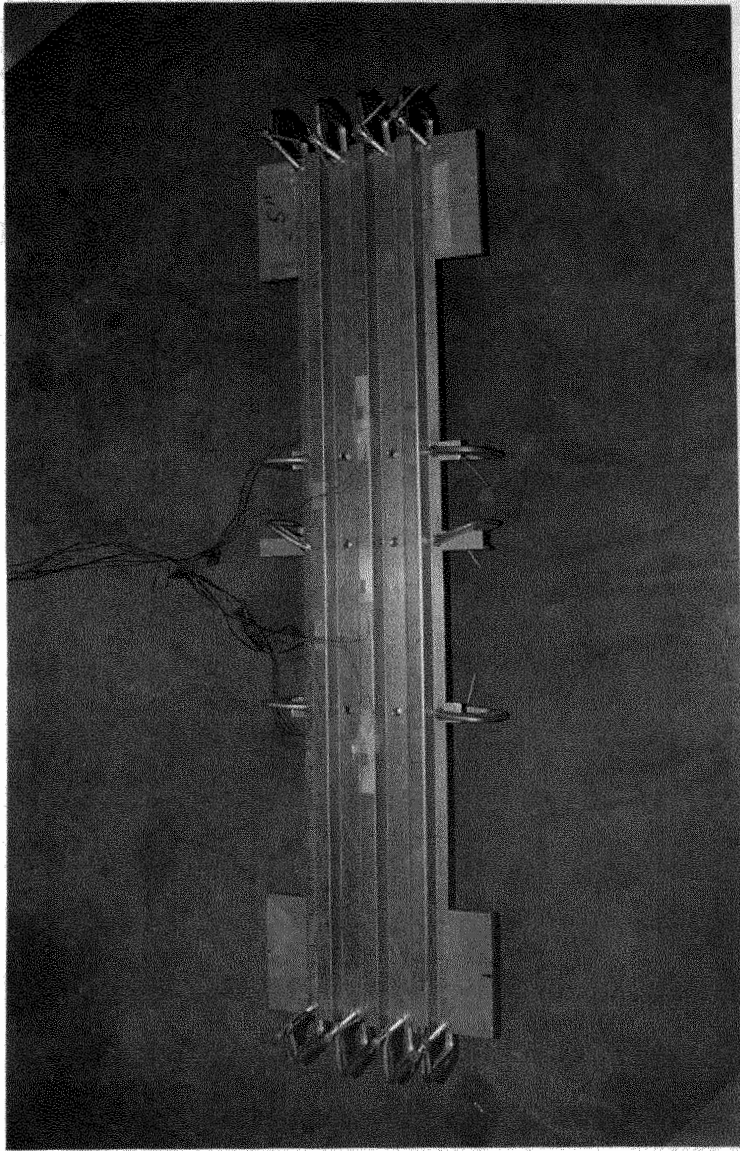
Specimen with Screws Penetrating through Tension Flanges
